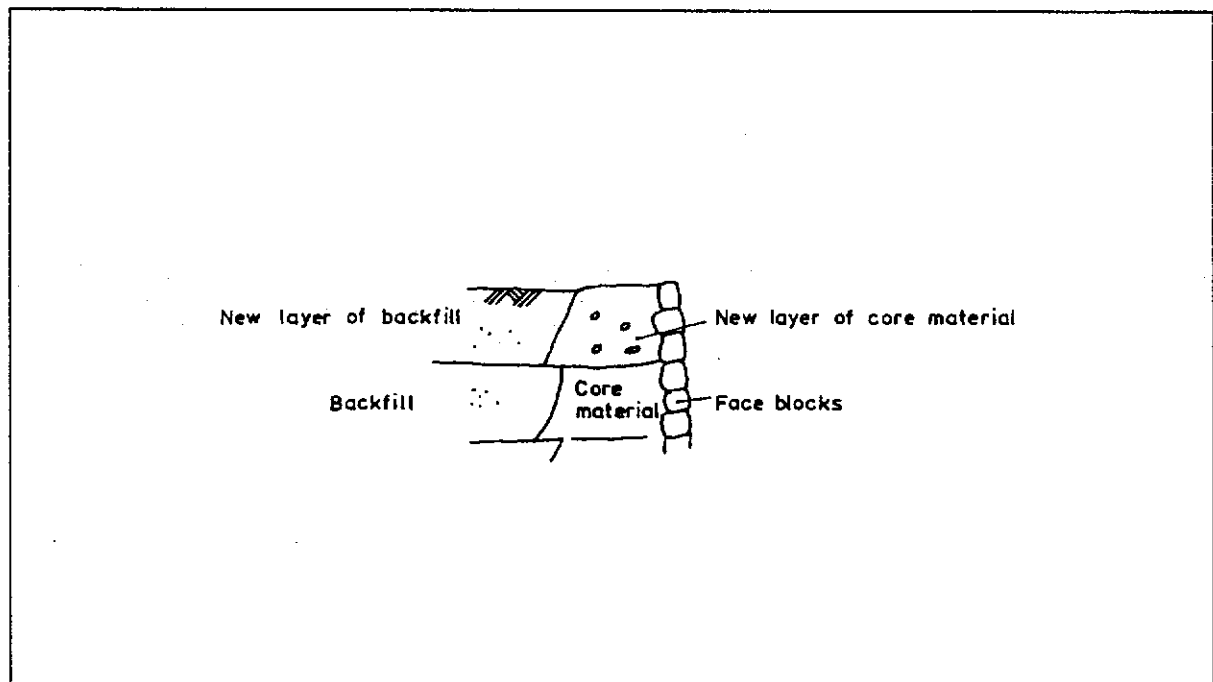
Stone Rubble Retaining Walls without Rear Blocks
